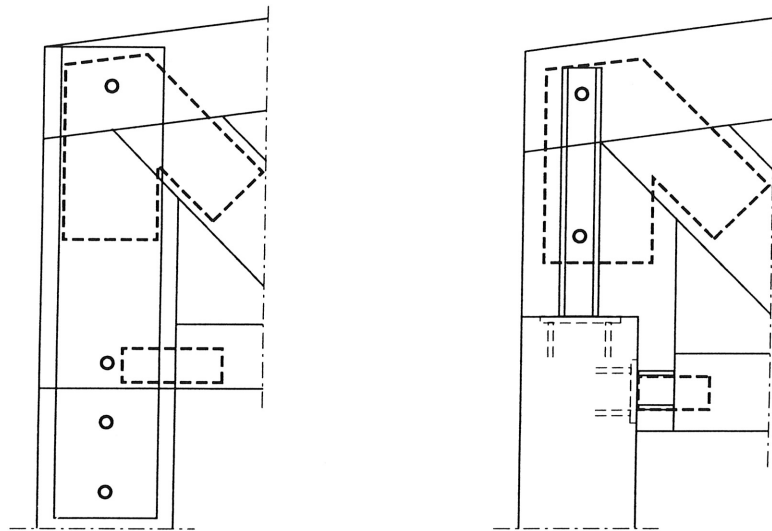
Examples of joints between MNC Kerto-LVL trusses and columns.
